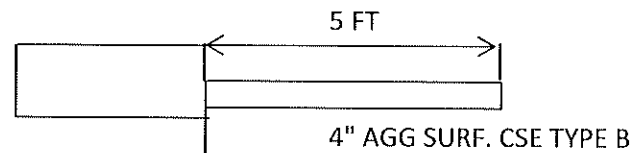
DETAIL OF SIDE ROAD INTERSECTION (14 EACH)
